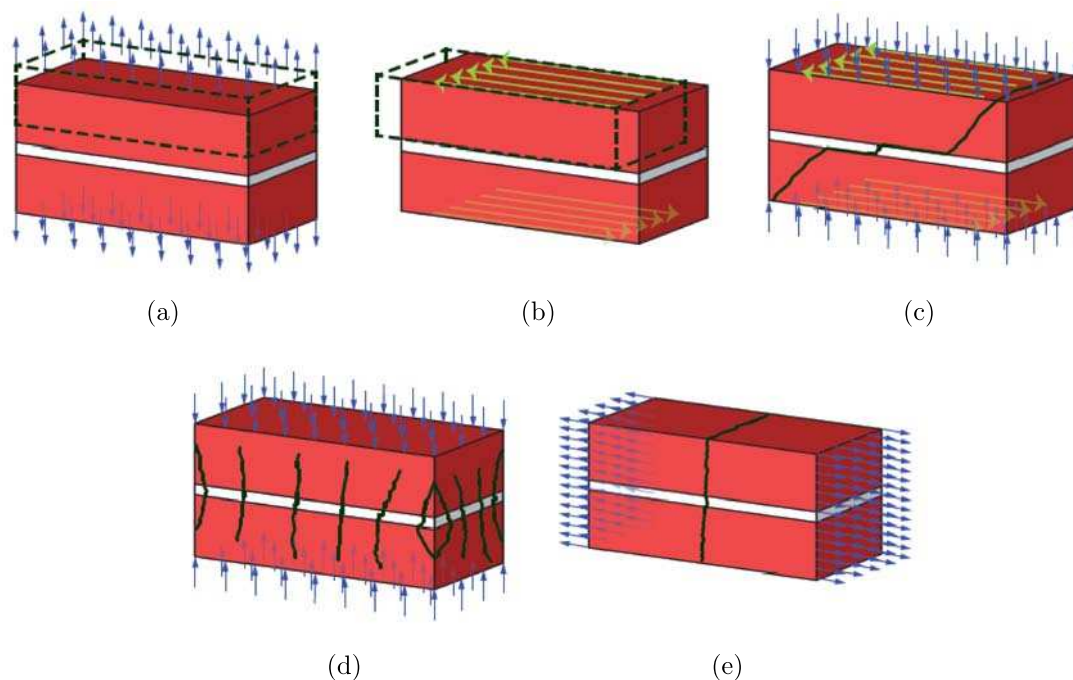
Masonry failure mechanisms (at a two-block masonry assemblage scale, from [11]): (a) block-mortar bond tensile failure, (b) block-mortar bond shear sliding, (c) diagonal masonry cracking, (d) masonry crushing, and (e) block and mortar tensile cracking.
